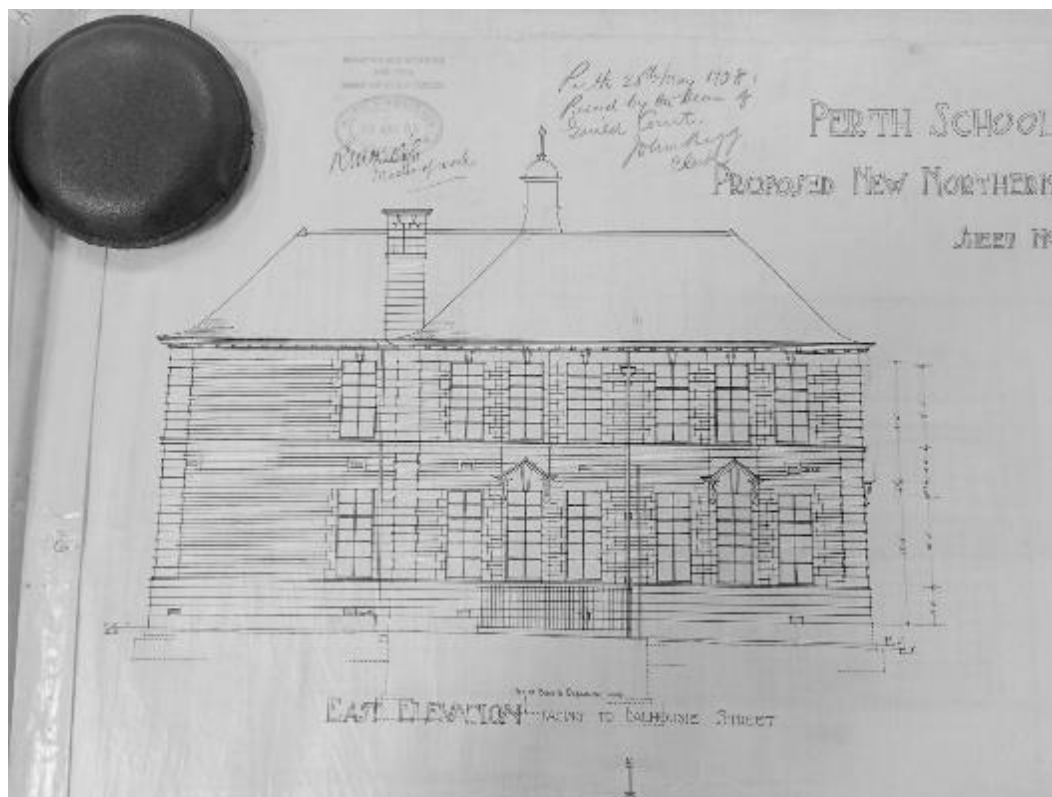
Original architects drawing of East facing elevation of Balhousie Primary School (© Perth and Kinross Archives E/MP/P/115).
